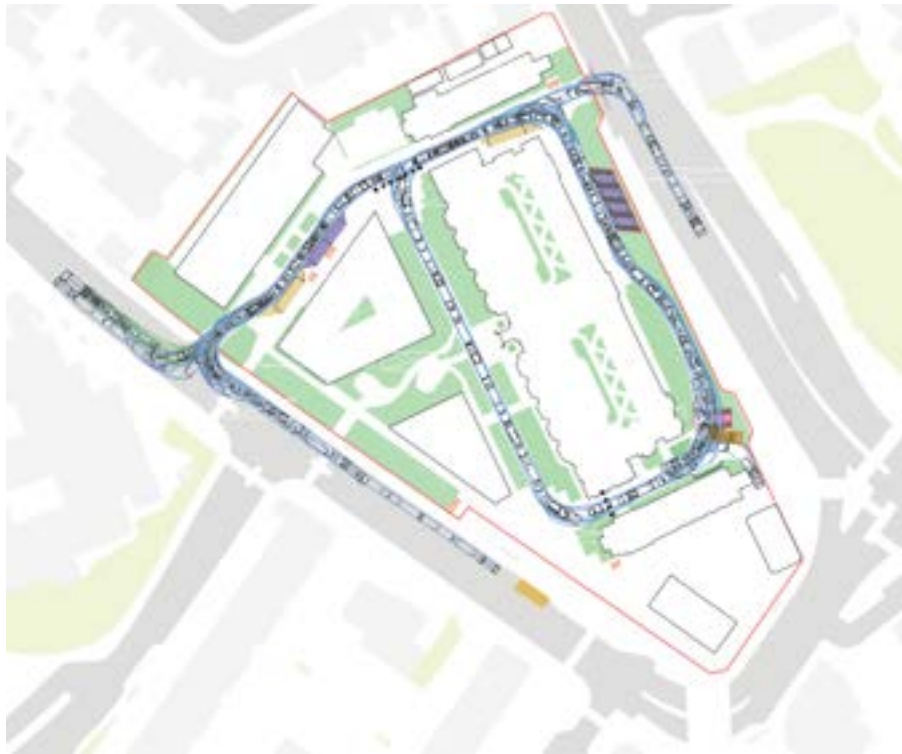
Proposed tracking, parking, loading bay and vehicle access diagram.
